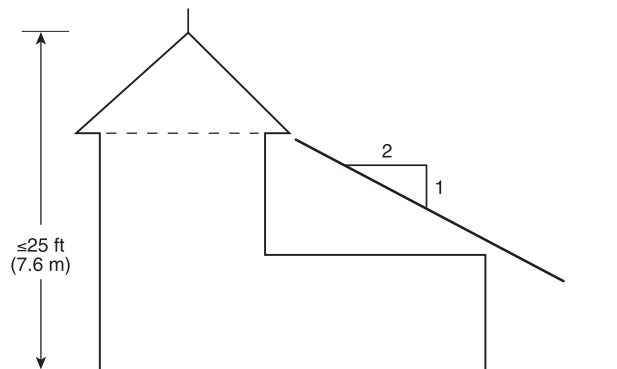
(b) Lower Roof Protection Provided by Pitched-Roof Buildings 25 ft (7.6 m) or Less in Height.
